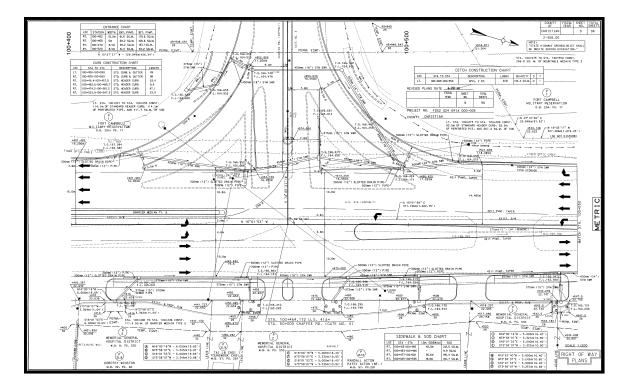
U.S. Route 41A and Screaming Eagle Boulevard Intersection Improvements, from KTC plans for U.S. Route 41A widening.
